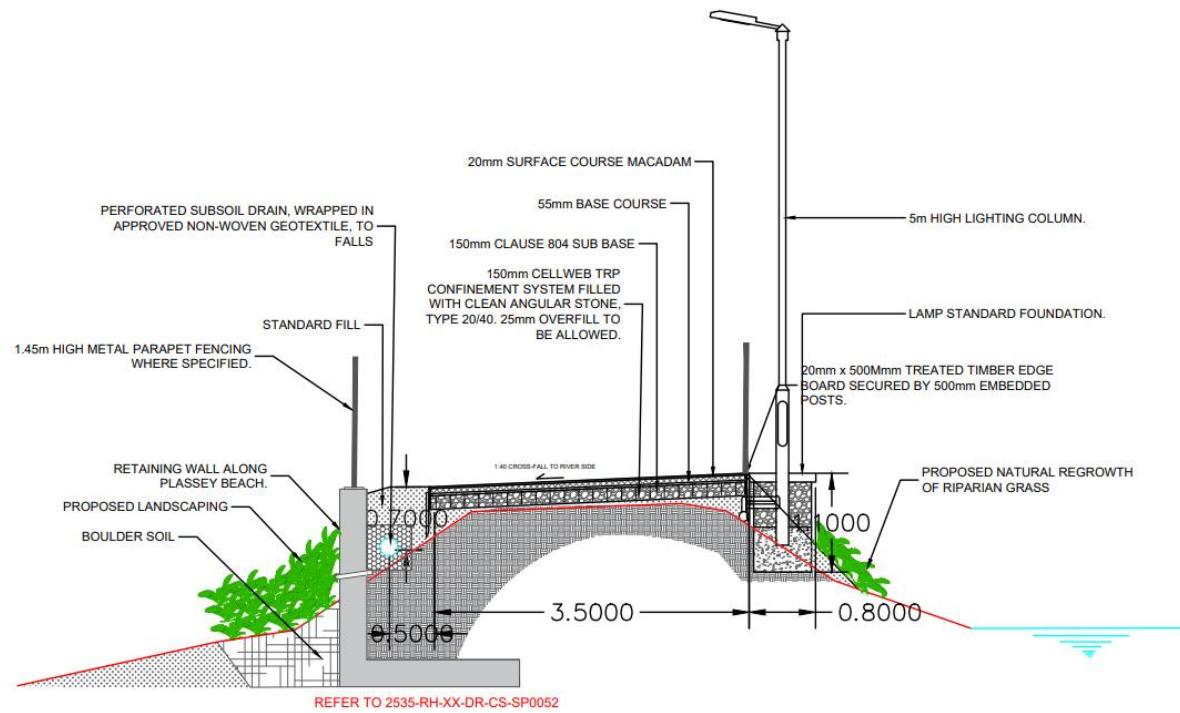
Proposed plan of ramp and Bridge 5 at Plassey Beach
